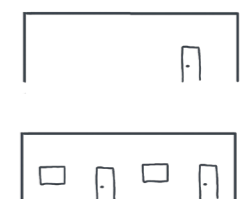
Avoid far stretches between openings in the façades, windows or doors (Minoura, 2019).
